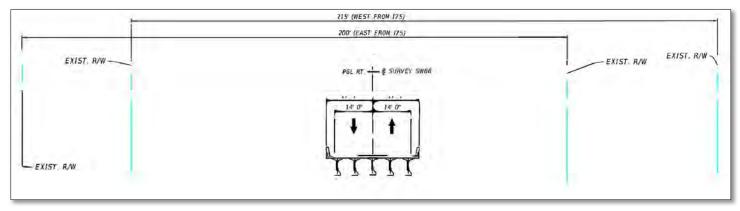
Existing Typical Section of SW 66th Street Bridge # 360048 (Over I-75)
